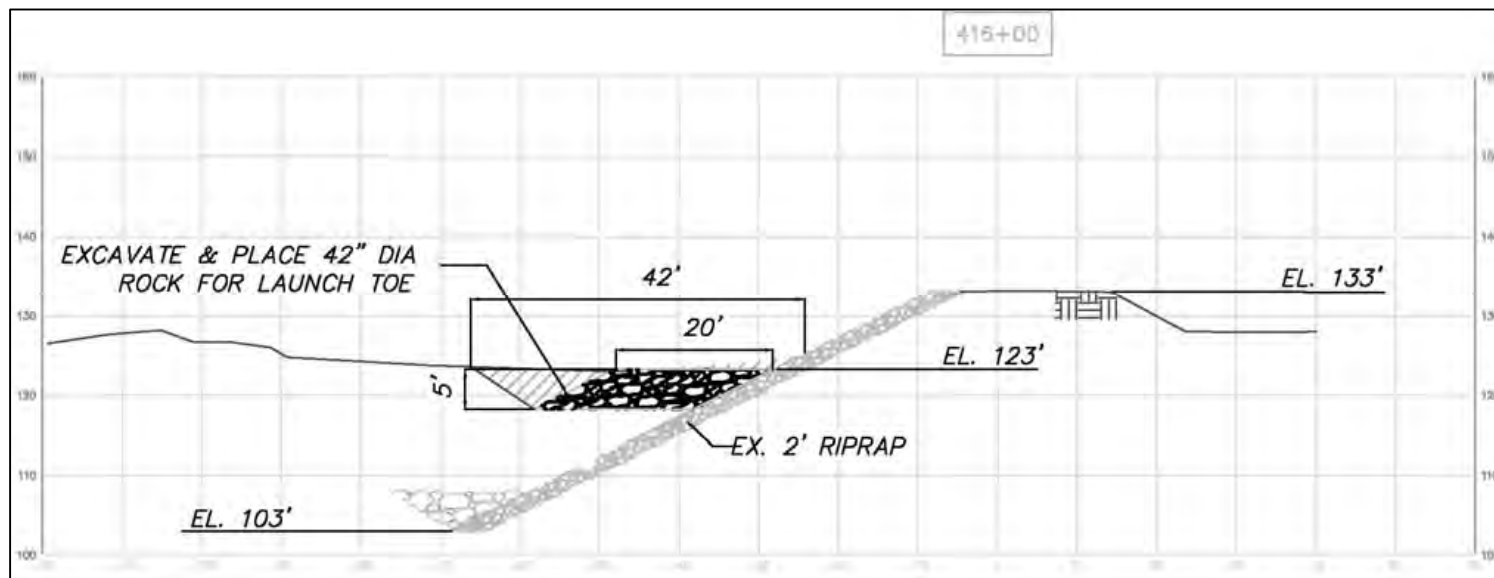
Typical Cross Section of Measure 11, Failure Reach 2
